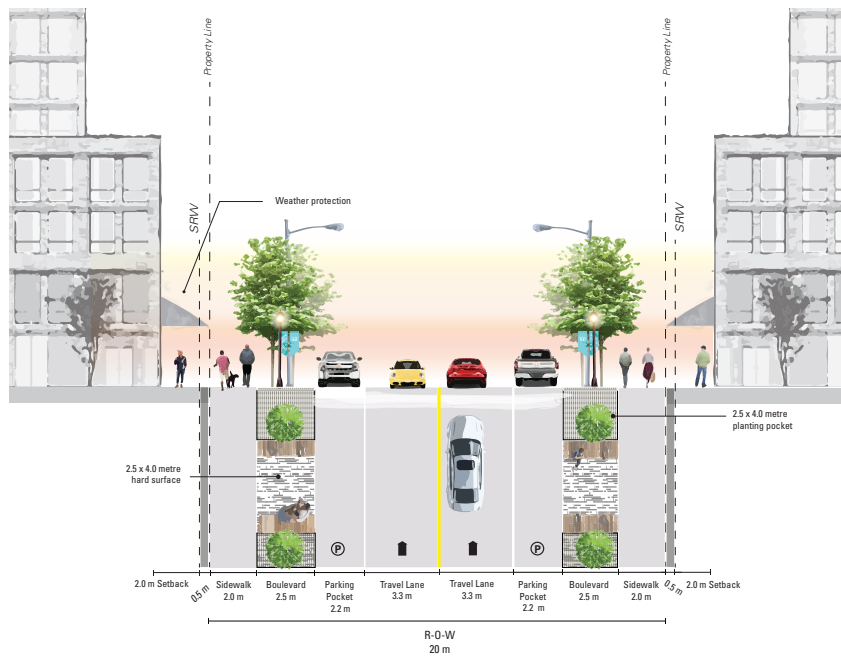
24A Ave Commercial Village High Street with Parking 20 m Cross-section
